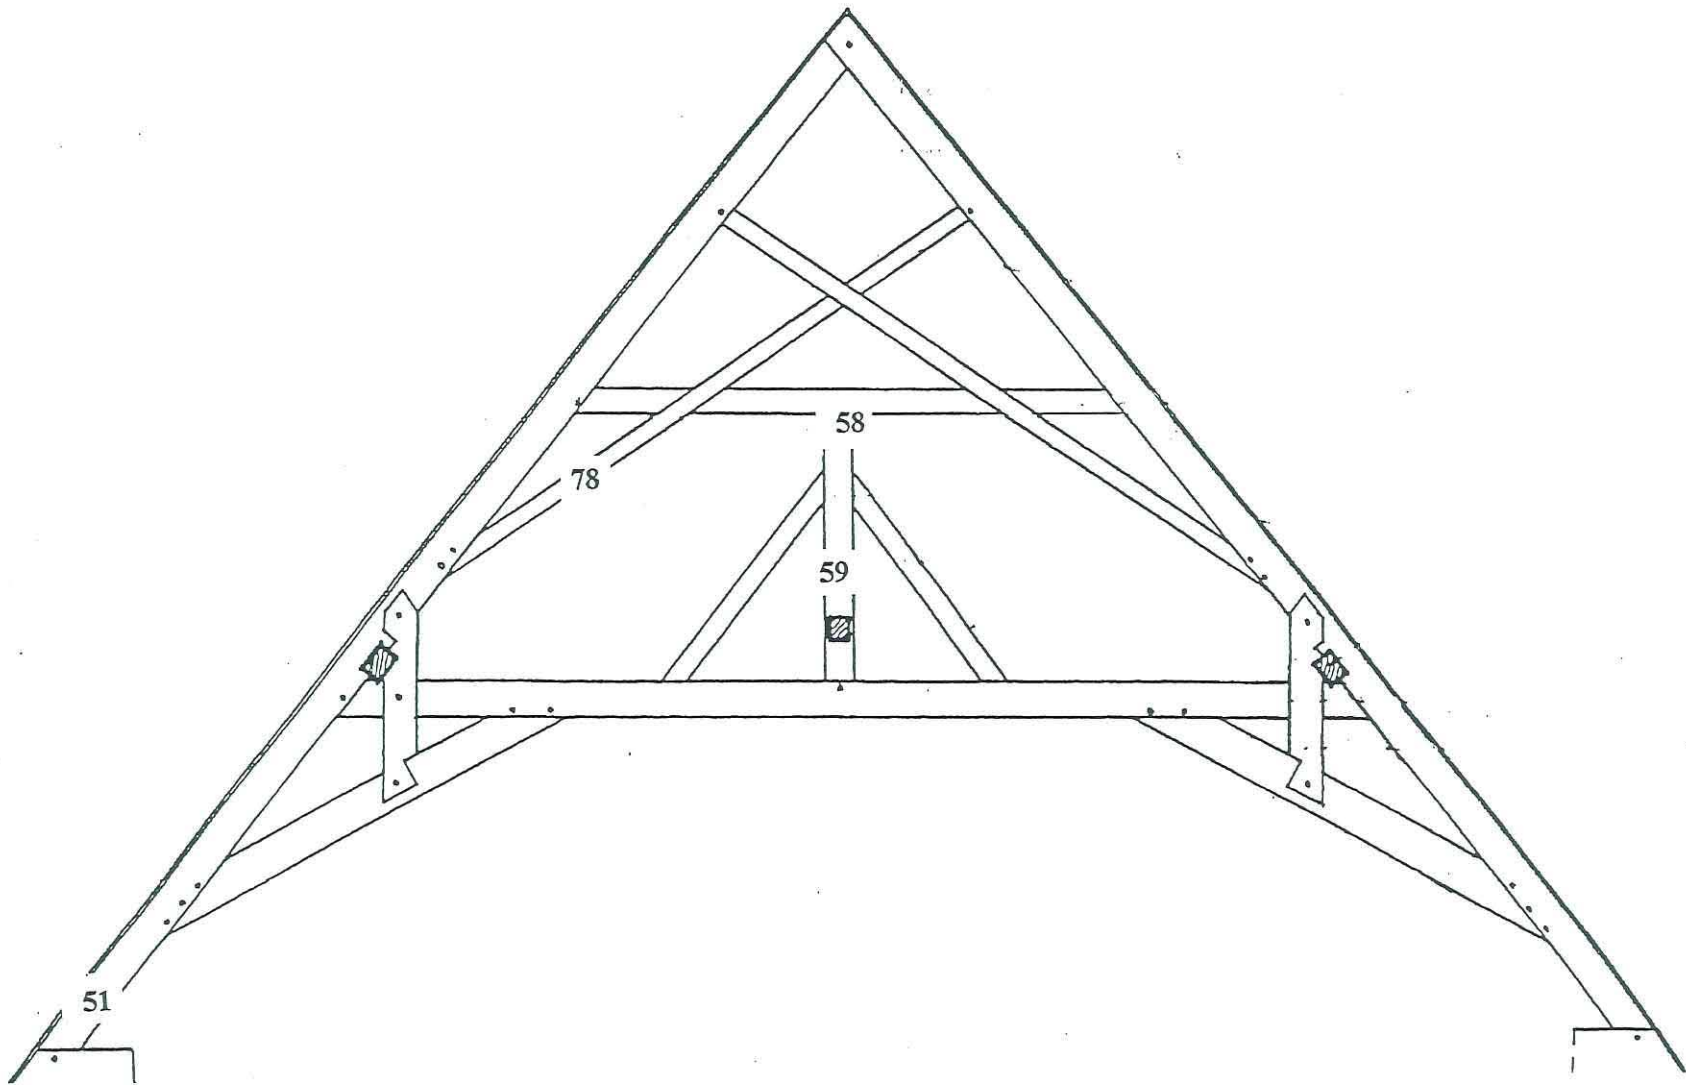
Drawing of frame 21 of the Choir and crossing, viewed from the east, to show sample locations
